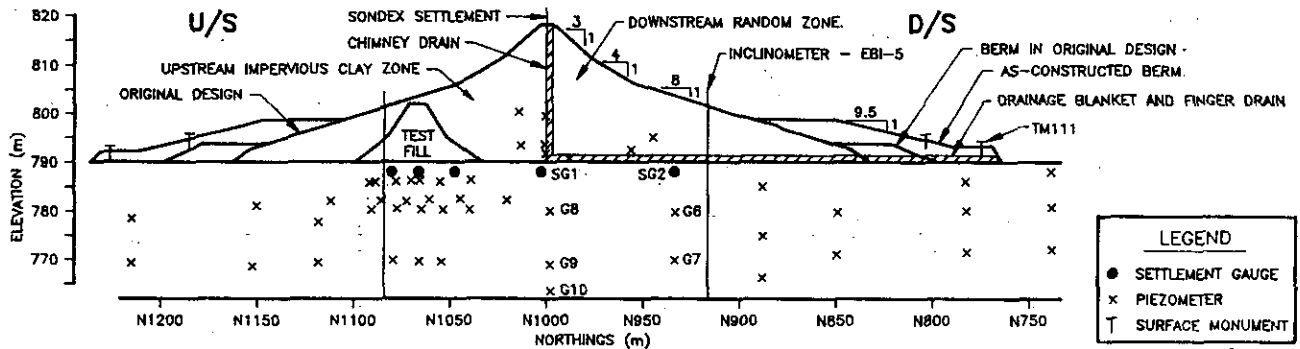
TYPICAL DAM SECTION AND INSTRUMENTS
